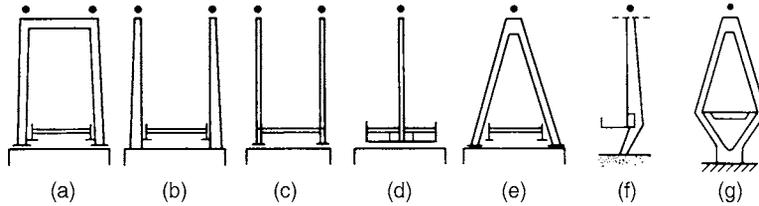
Shapes of pylons used for cable-stayed bridges. (a) Portal frame with top cross member. (b) Pylon fixed to pier and without top cross member. (c) Pylon fixed to girders and without top cross member. (d) Axial pylon fixed to superstructure. (e) A-shaped pylon. (f) Laterally displaced pylon fixed to pier. (g) Diamond-shaped pylon. (Reprinted with permission from A. Feige, "The Evolution of German Cable-Stayed Bridges—An Overall Survey," *Acier-Stahl-Steel (English version)*, no. 12, December 1966, reprinted in the *AISC Journal*, July 1967.)
